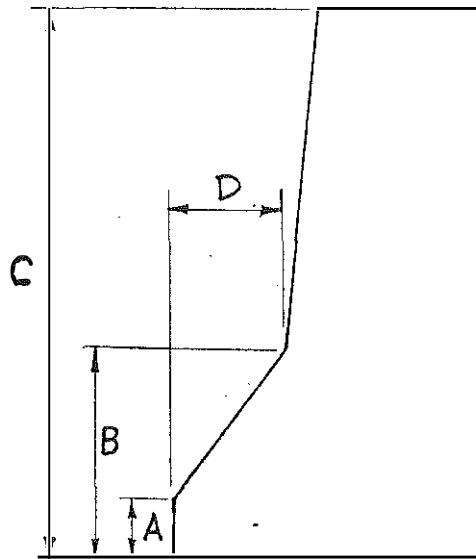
Typical Cross Sections of Concrete Barriers in Kentucky.
